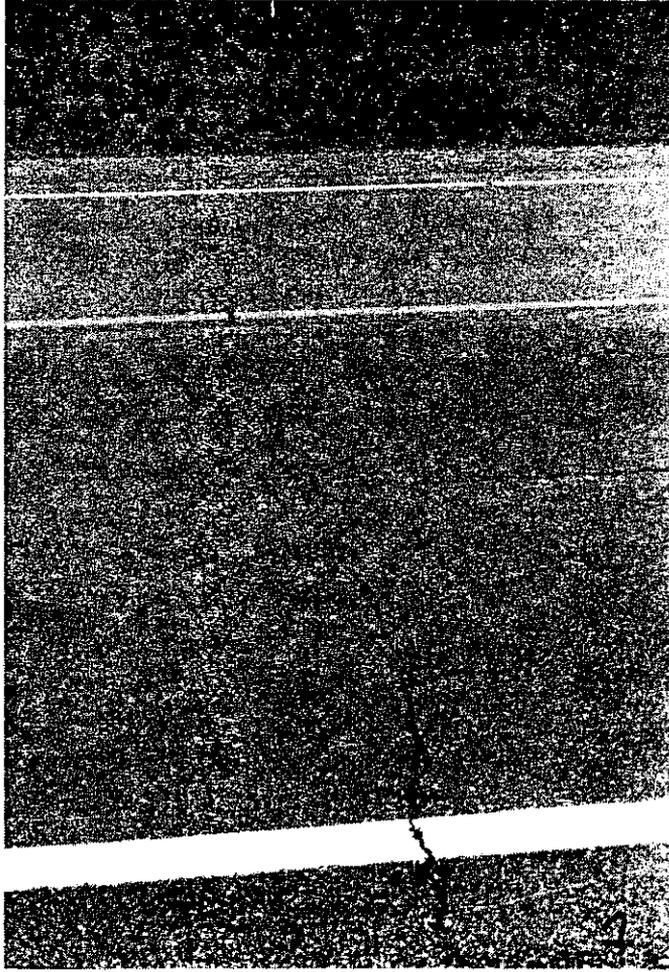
Typical Crack in Heavy Duty Bituthene Test Section, Ill. 48.
